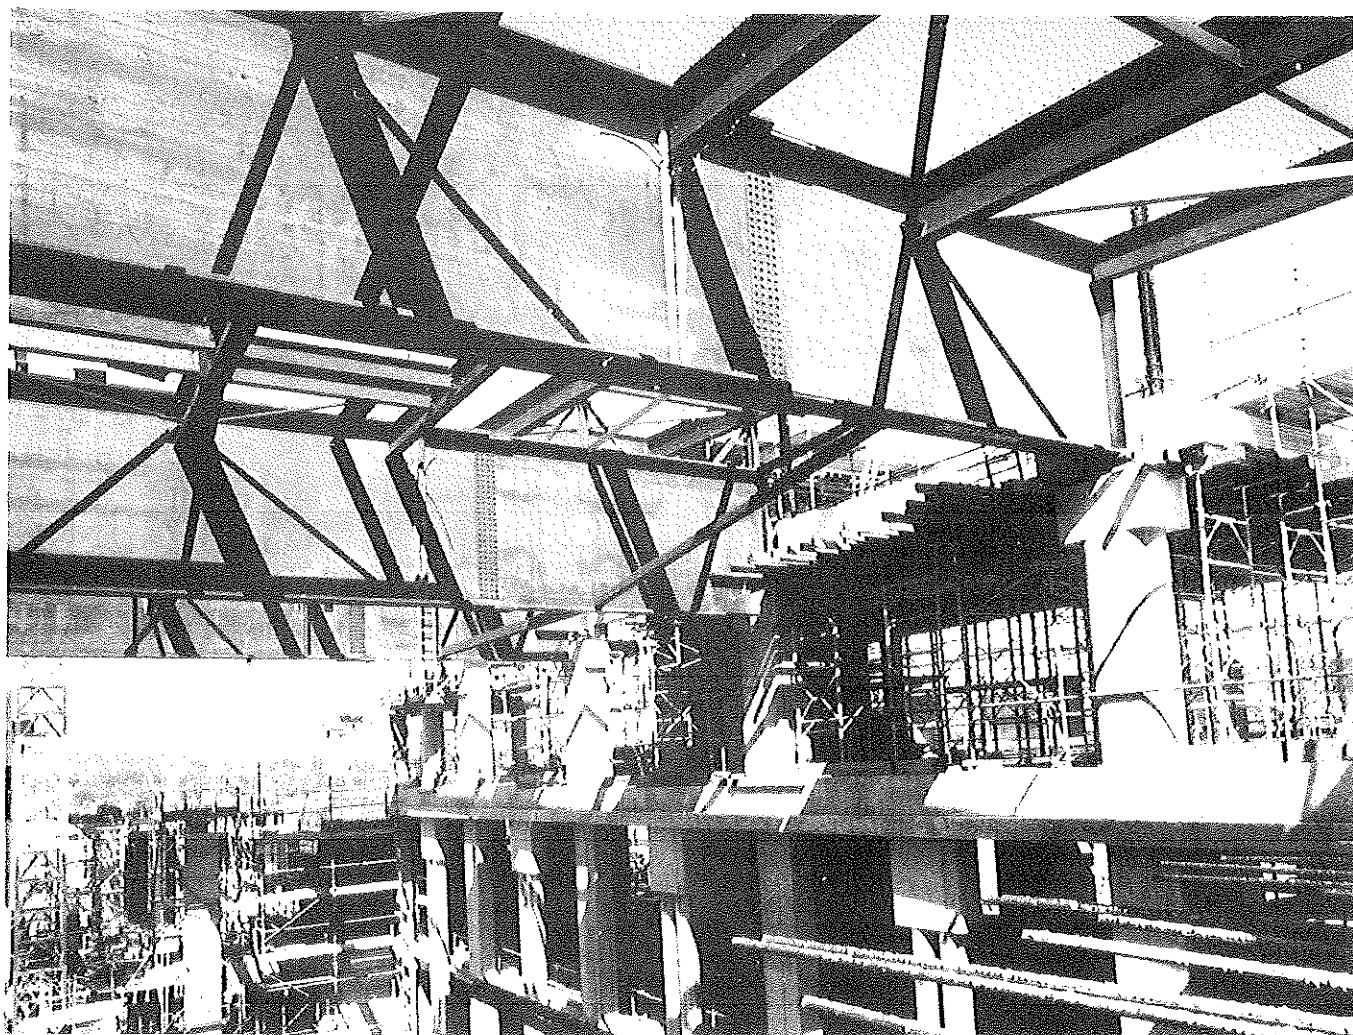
Great Hall roof beams in position prior to roof placement.
